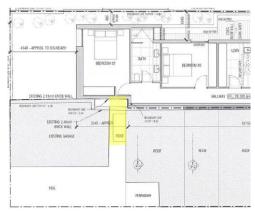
Location of walkway shown in yellow (Applicant submission – advertised plans)
